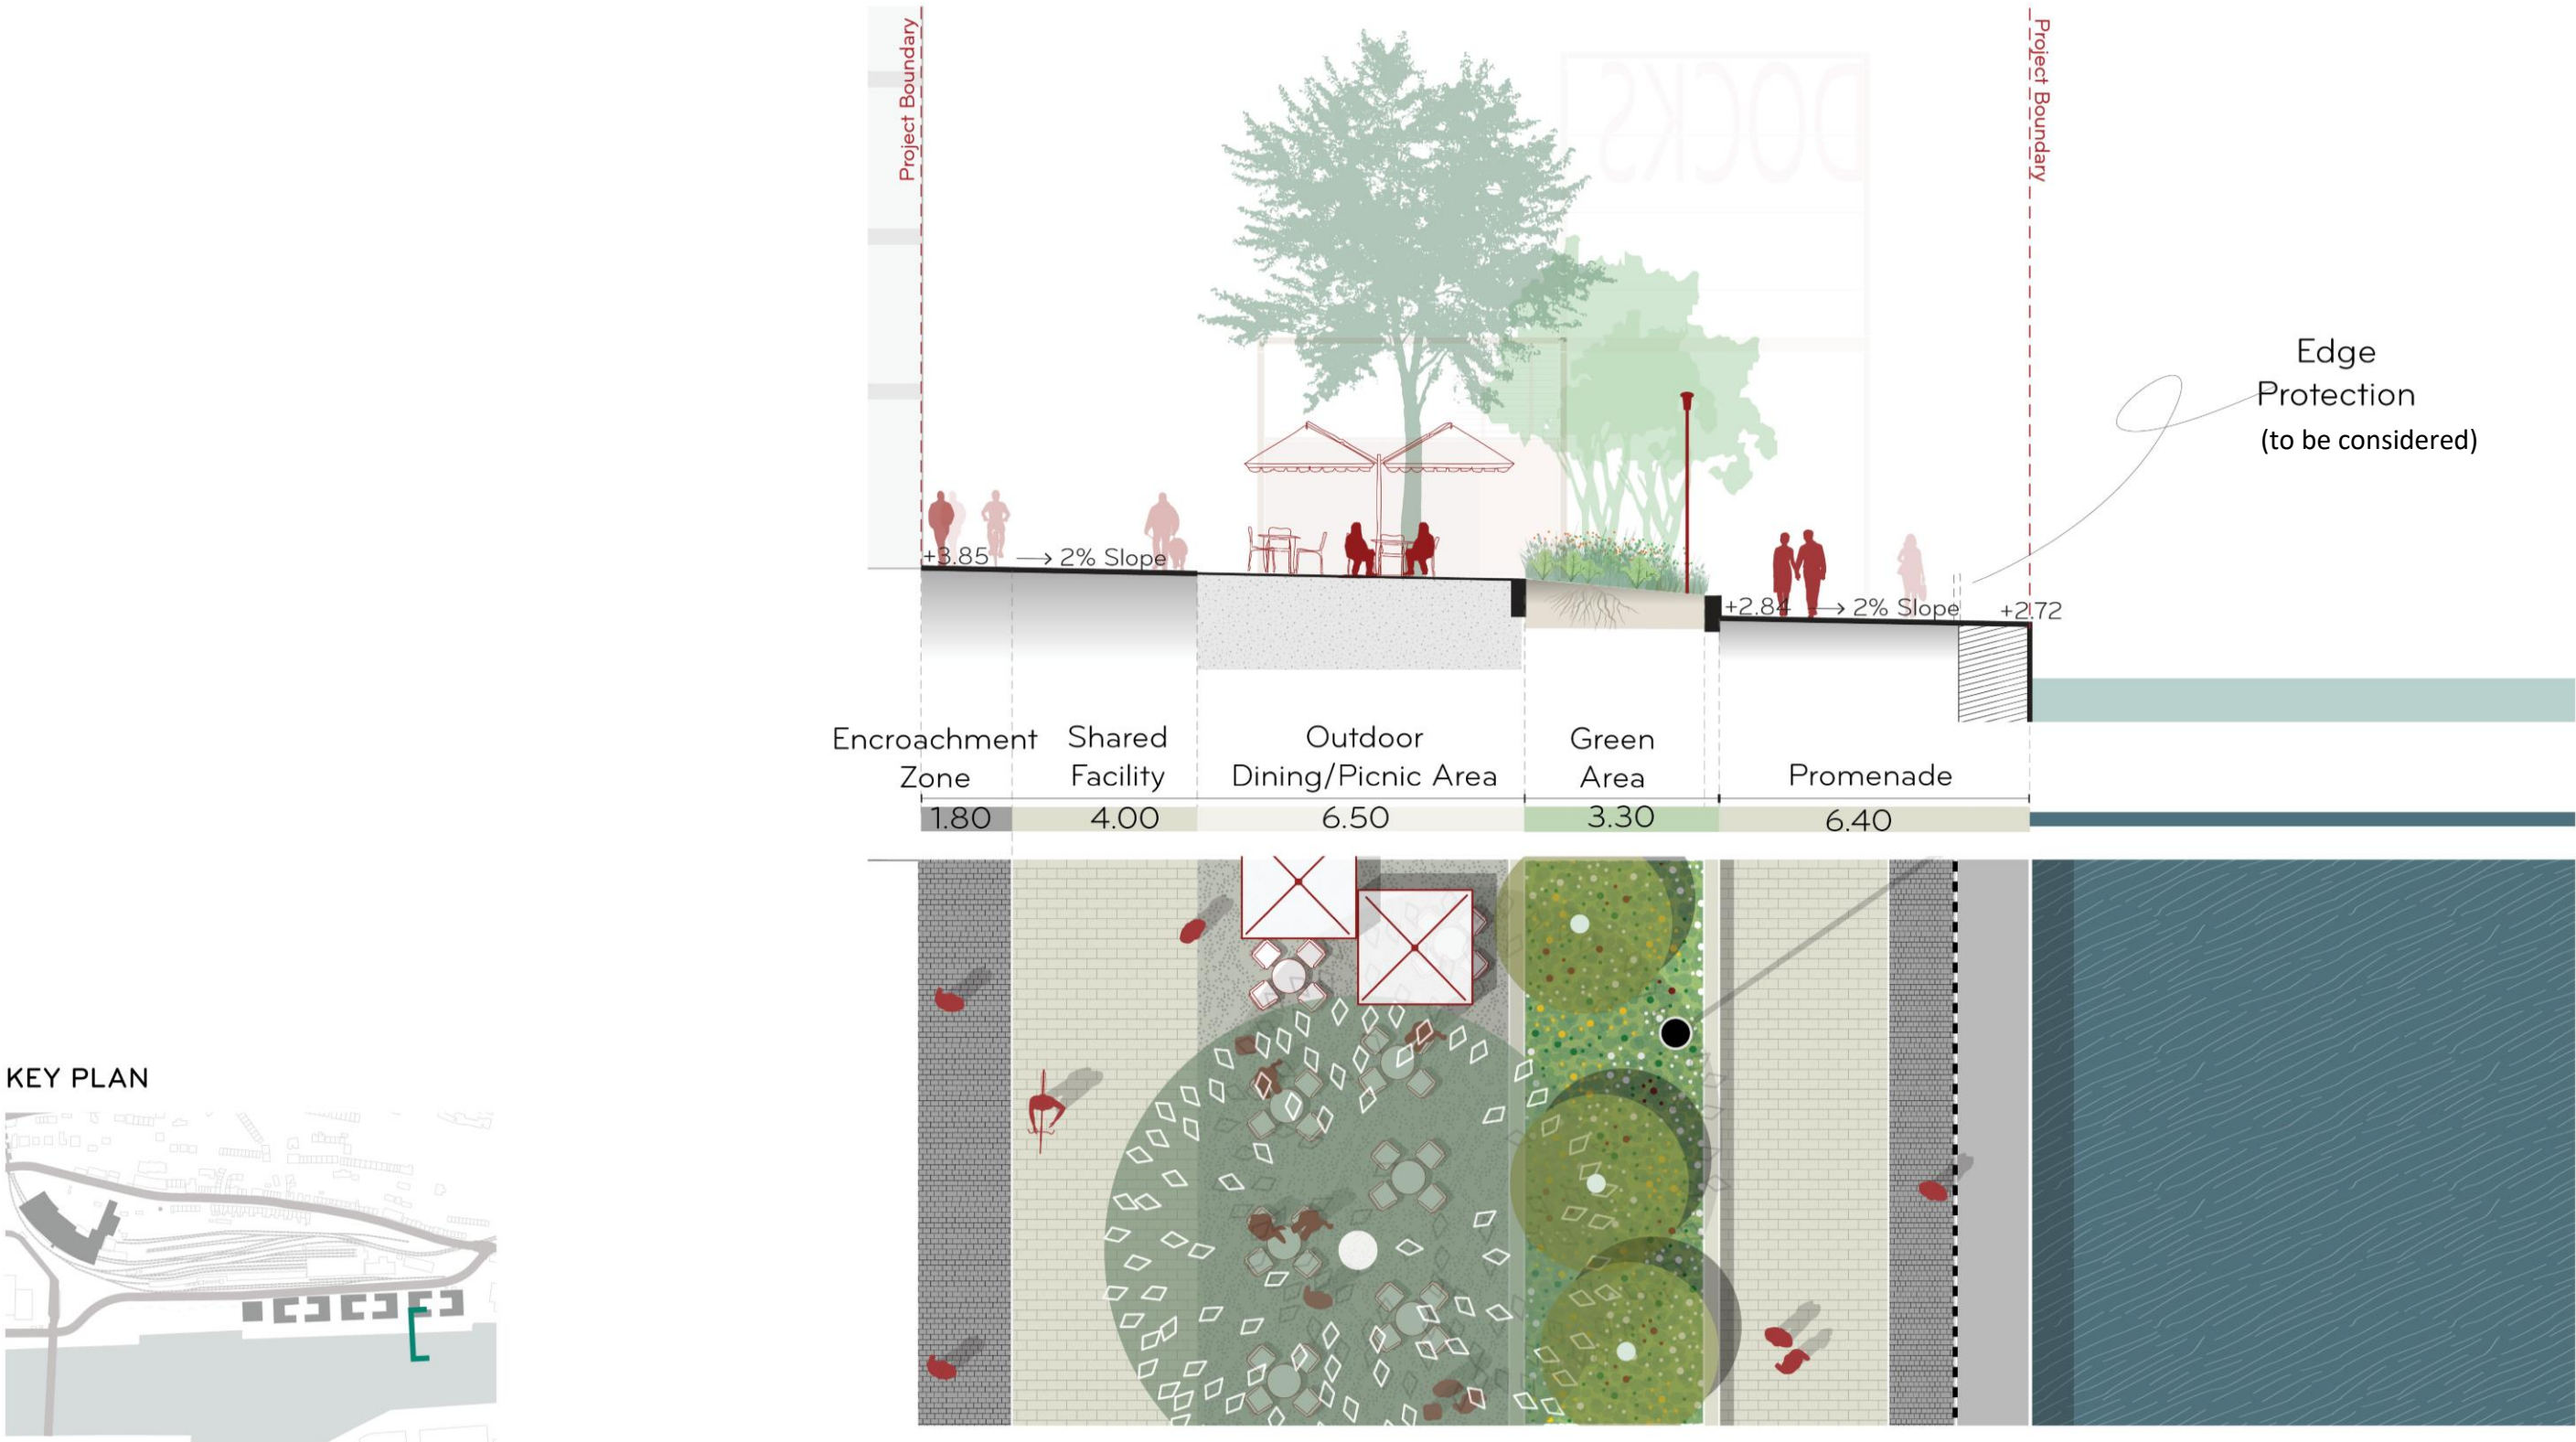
Water Promenade - Section 3 Outdoor Dining / Picnic Space
